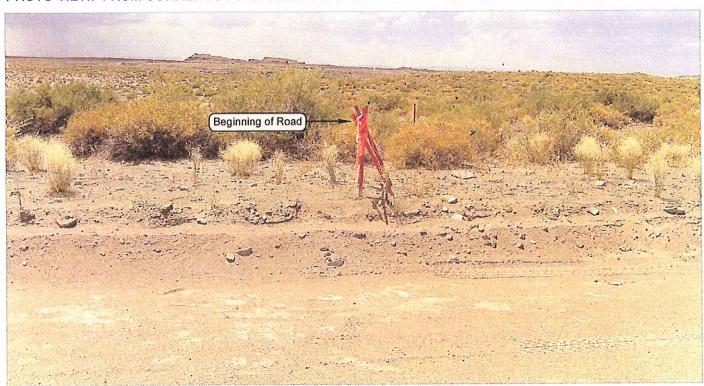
PHOTO VIEW: FROM BEGINNING OF PROPOSED ROAD
